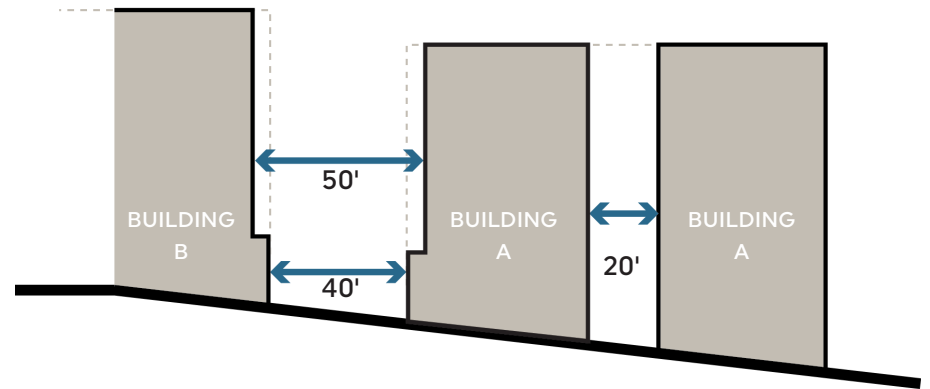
Building separation between Buildings A and B and between multiple structures in same buildable zone
